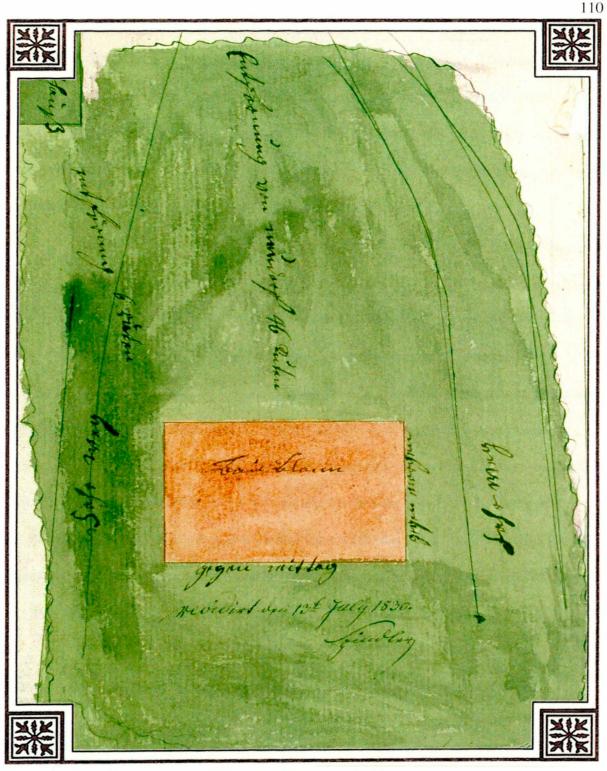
SITE PLAN FOR THE BÜTTNER COTTAGE IN NEUDORF
